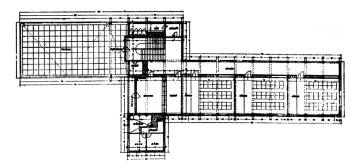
First floor plan of primary school building in Brno, Czechoslovakia (archit. Bohuslav Fuchs, Josef Polášek, 1928) [24].
